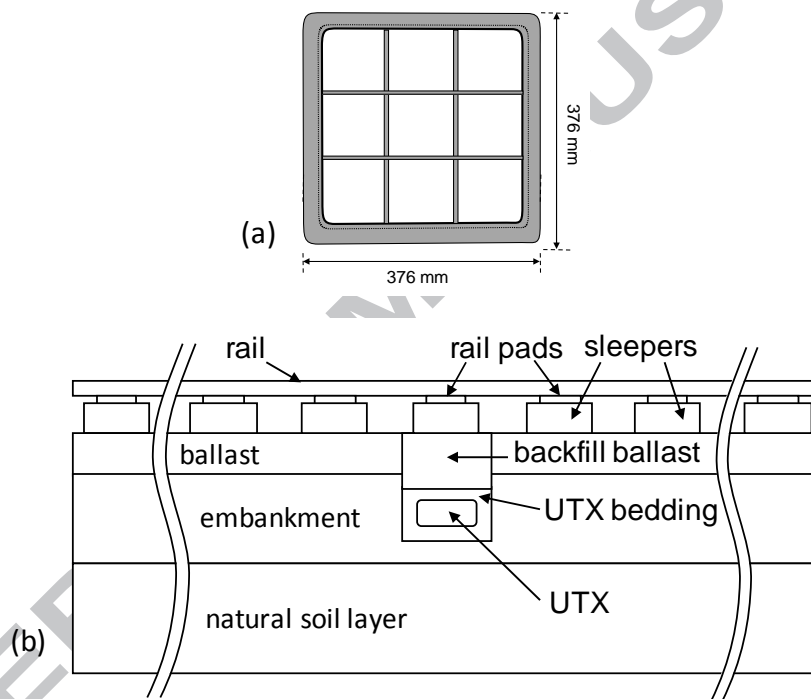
(a) Detail of plastic UTX cross-section (b) Model schematic for Site 2: a single plastic duct, below the ballast layer
